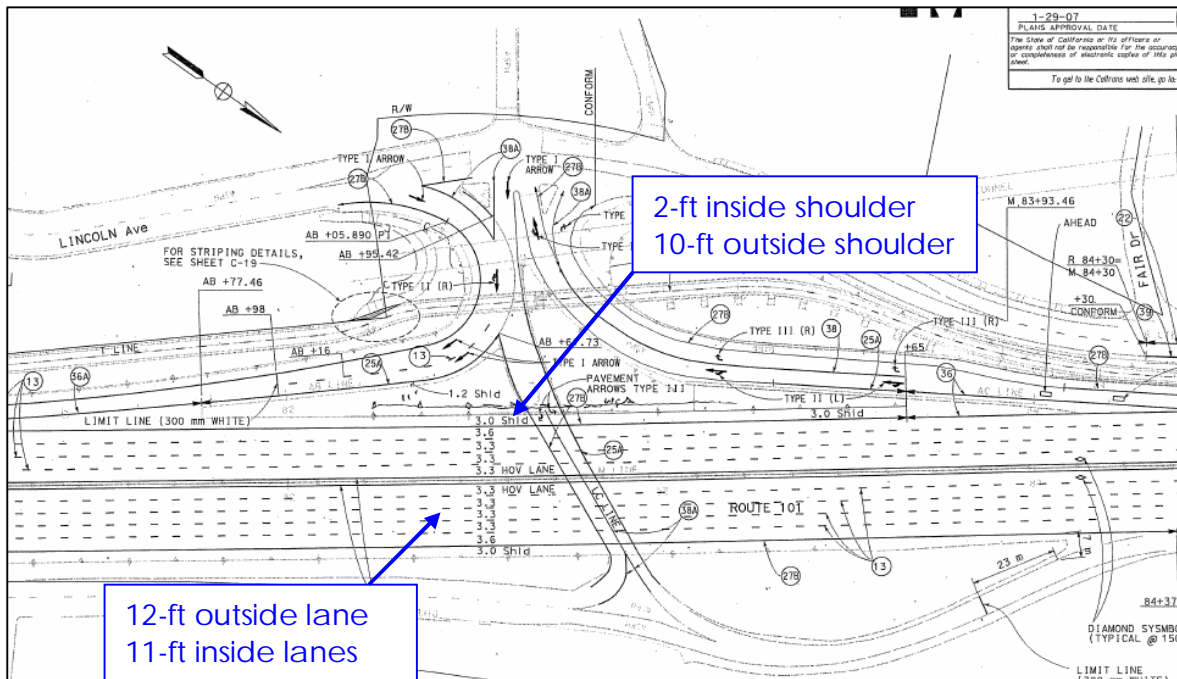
Portion of the Gap Closure Project Plan at the Lincoln Avenue Bridge
